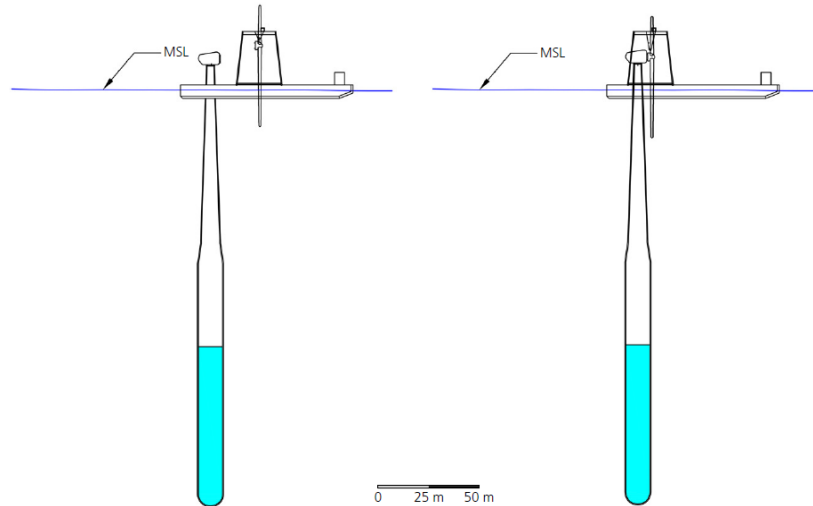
Wind Turbine installation (See Ref.[OP5])
